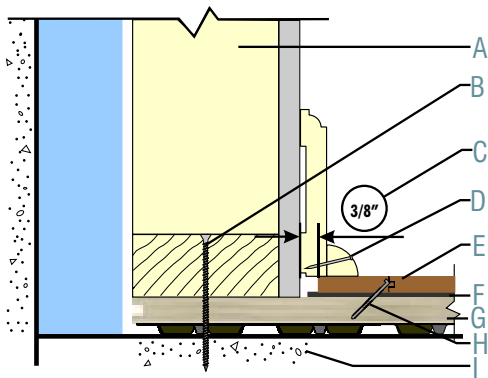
Section - Eng. Wood/Solid Wood Flooring
